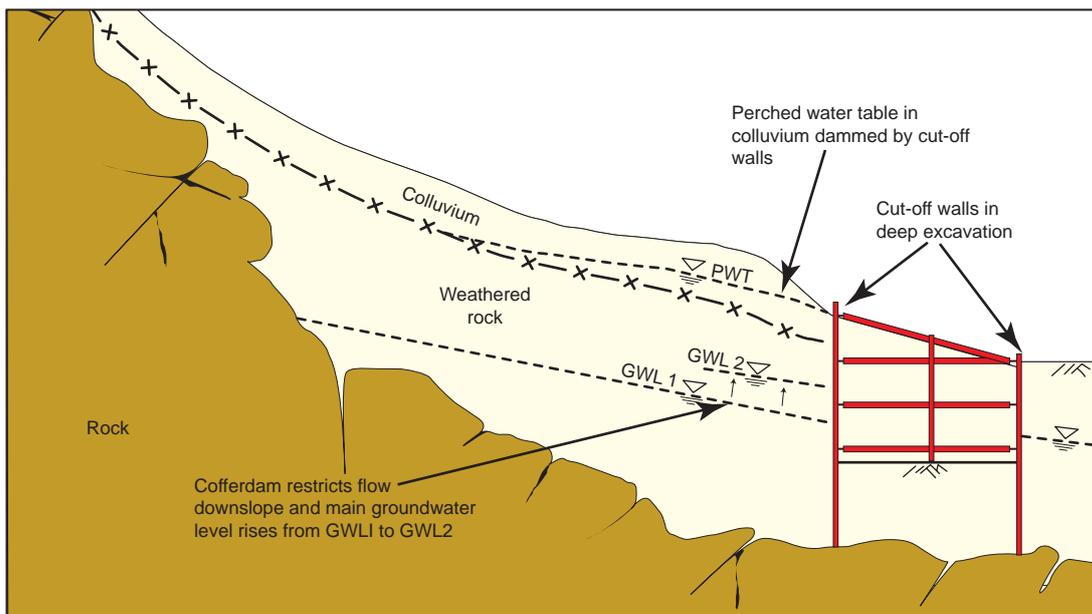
Groundwater damming on hillsides due to deep excavations
